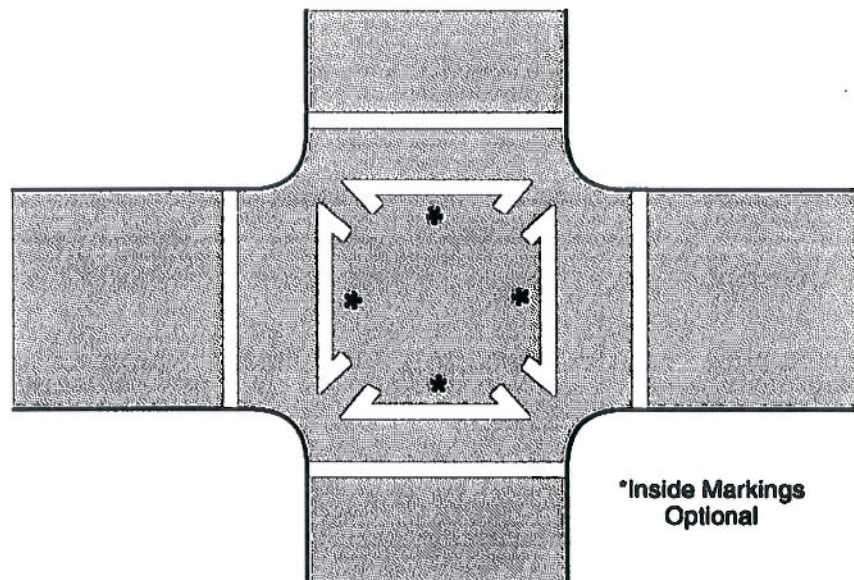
B-27. Examples of Markings for Roundabout Intersections with One-Lane Approaches
